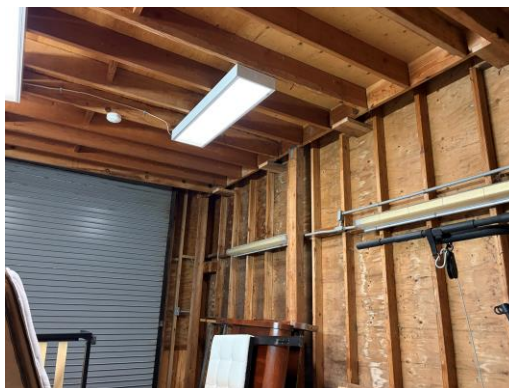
Coast Guard Building – Upper platform inside west side addition.
